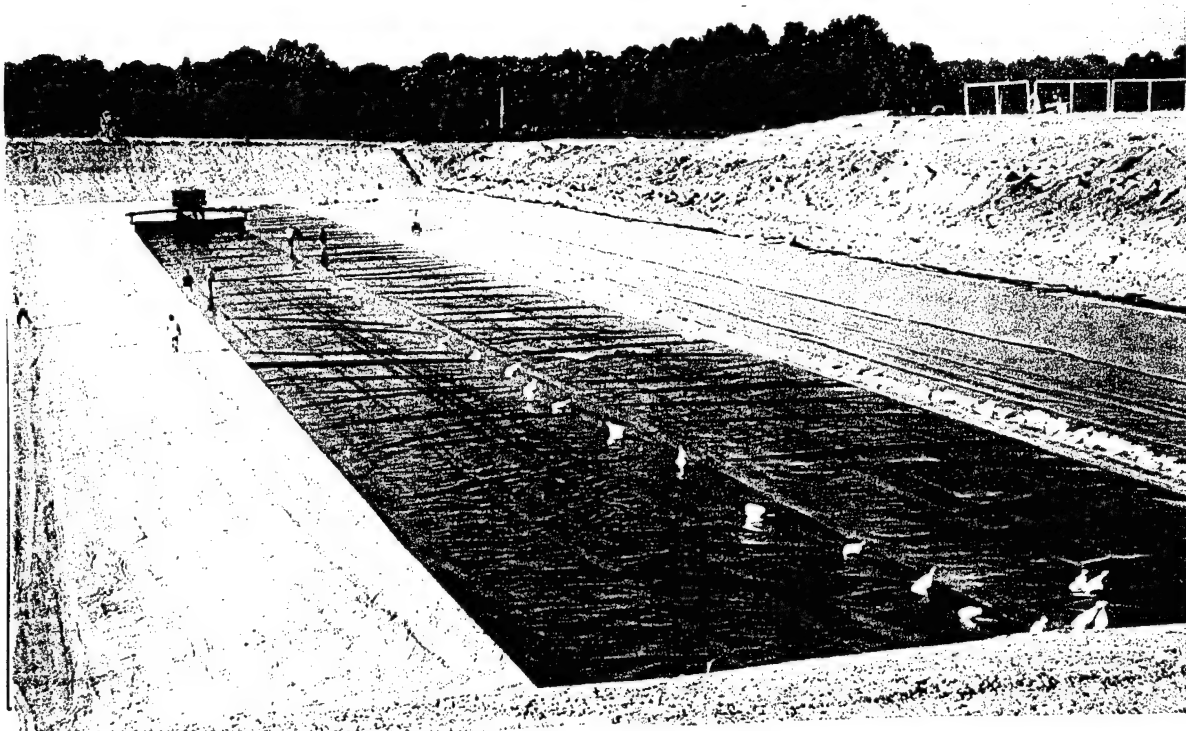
Geomembrane Being Installed at the Yaw Hill Solid Waste Disposal Facility, Terre Haute, Indiana
